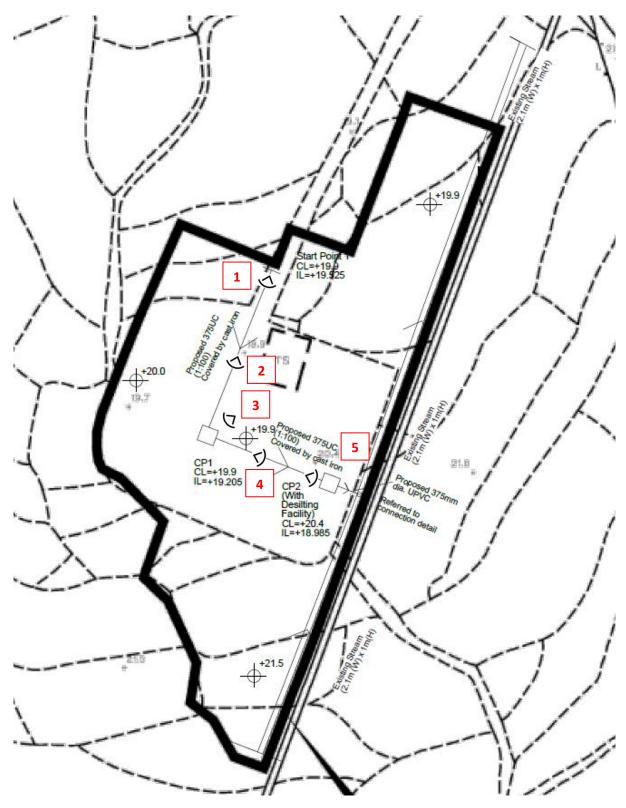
Drainage proposal accepted under previous application No. A/YL-SK/261
